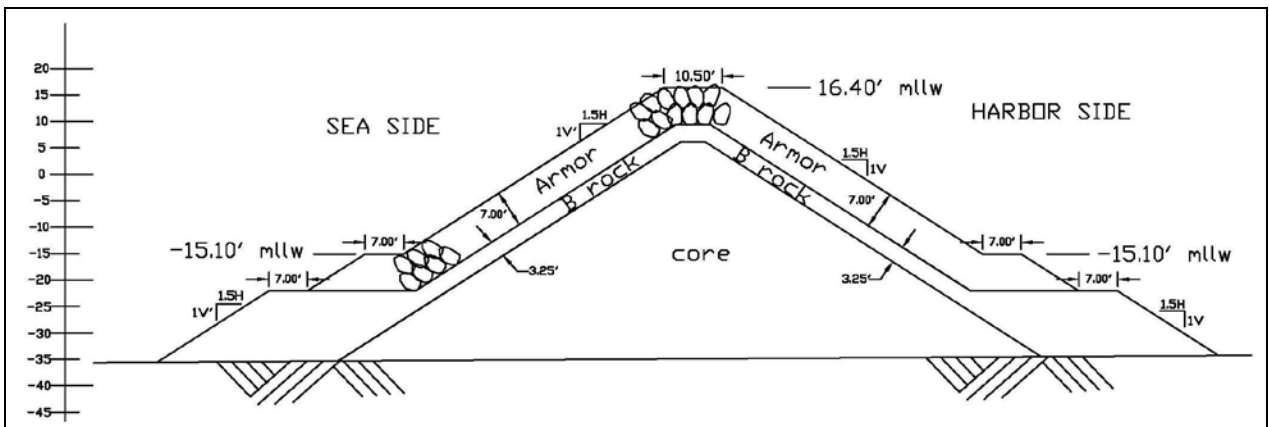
Main and North Breakwaters Extensions Cross Section for Alternative 15.
